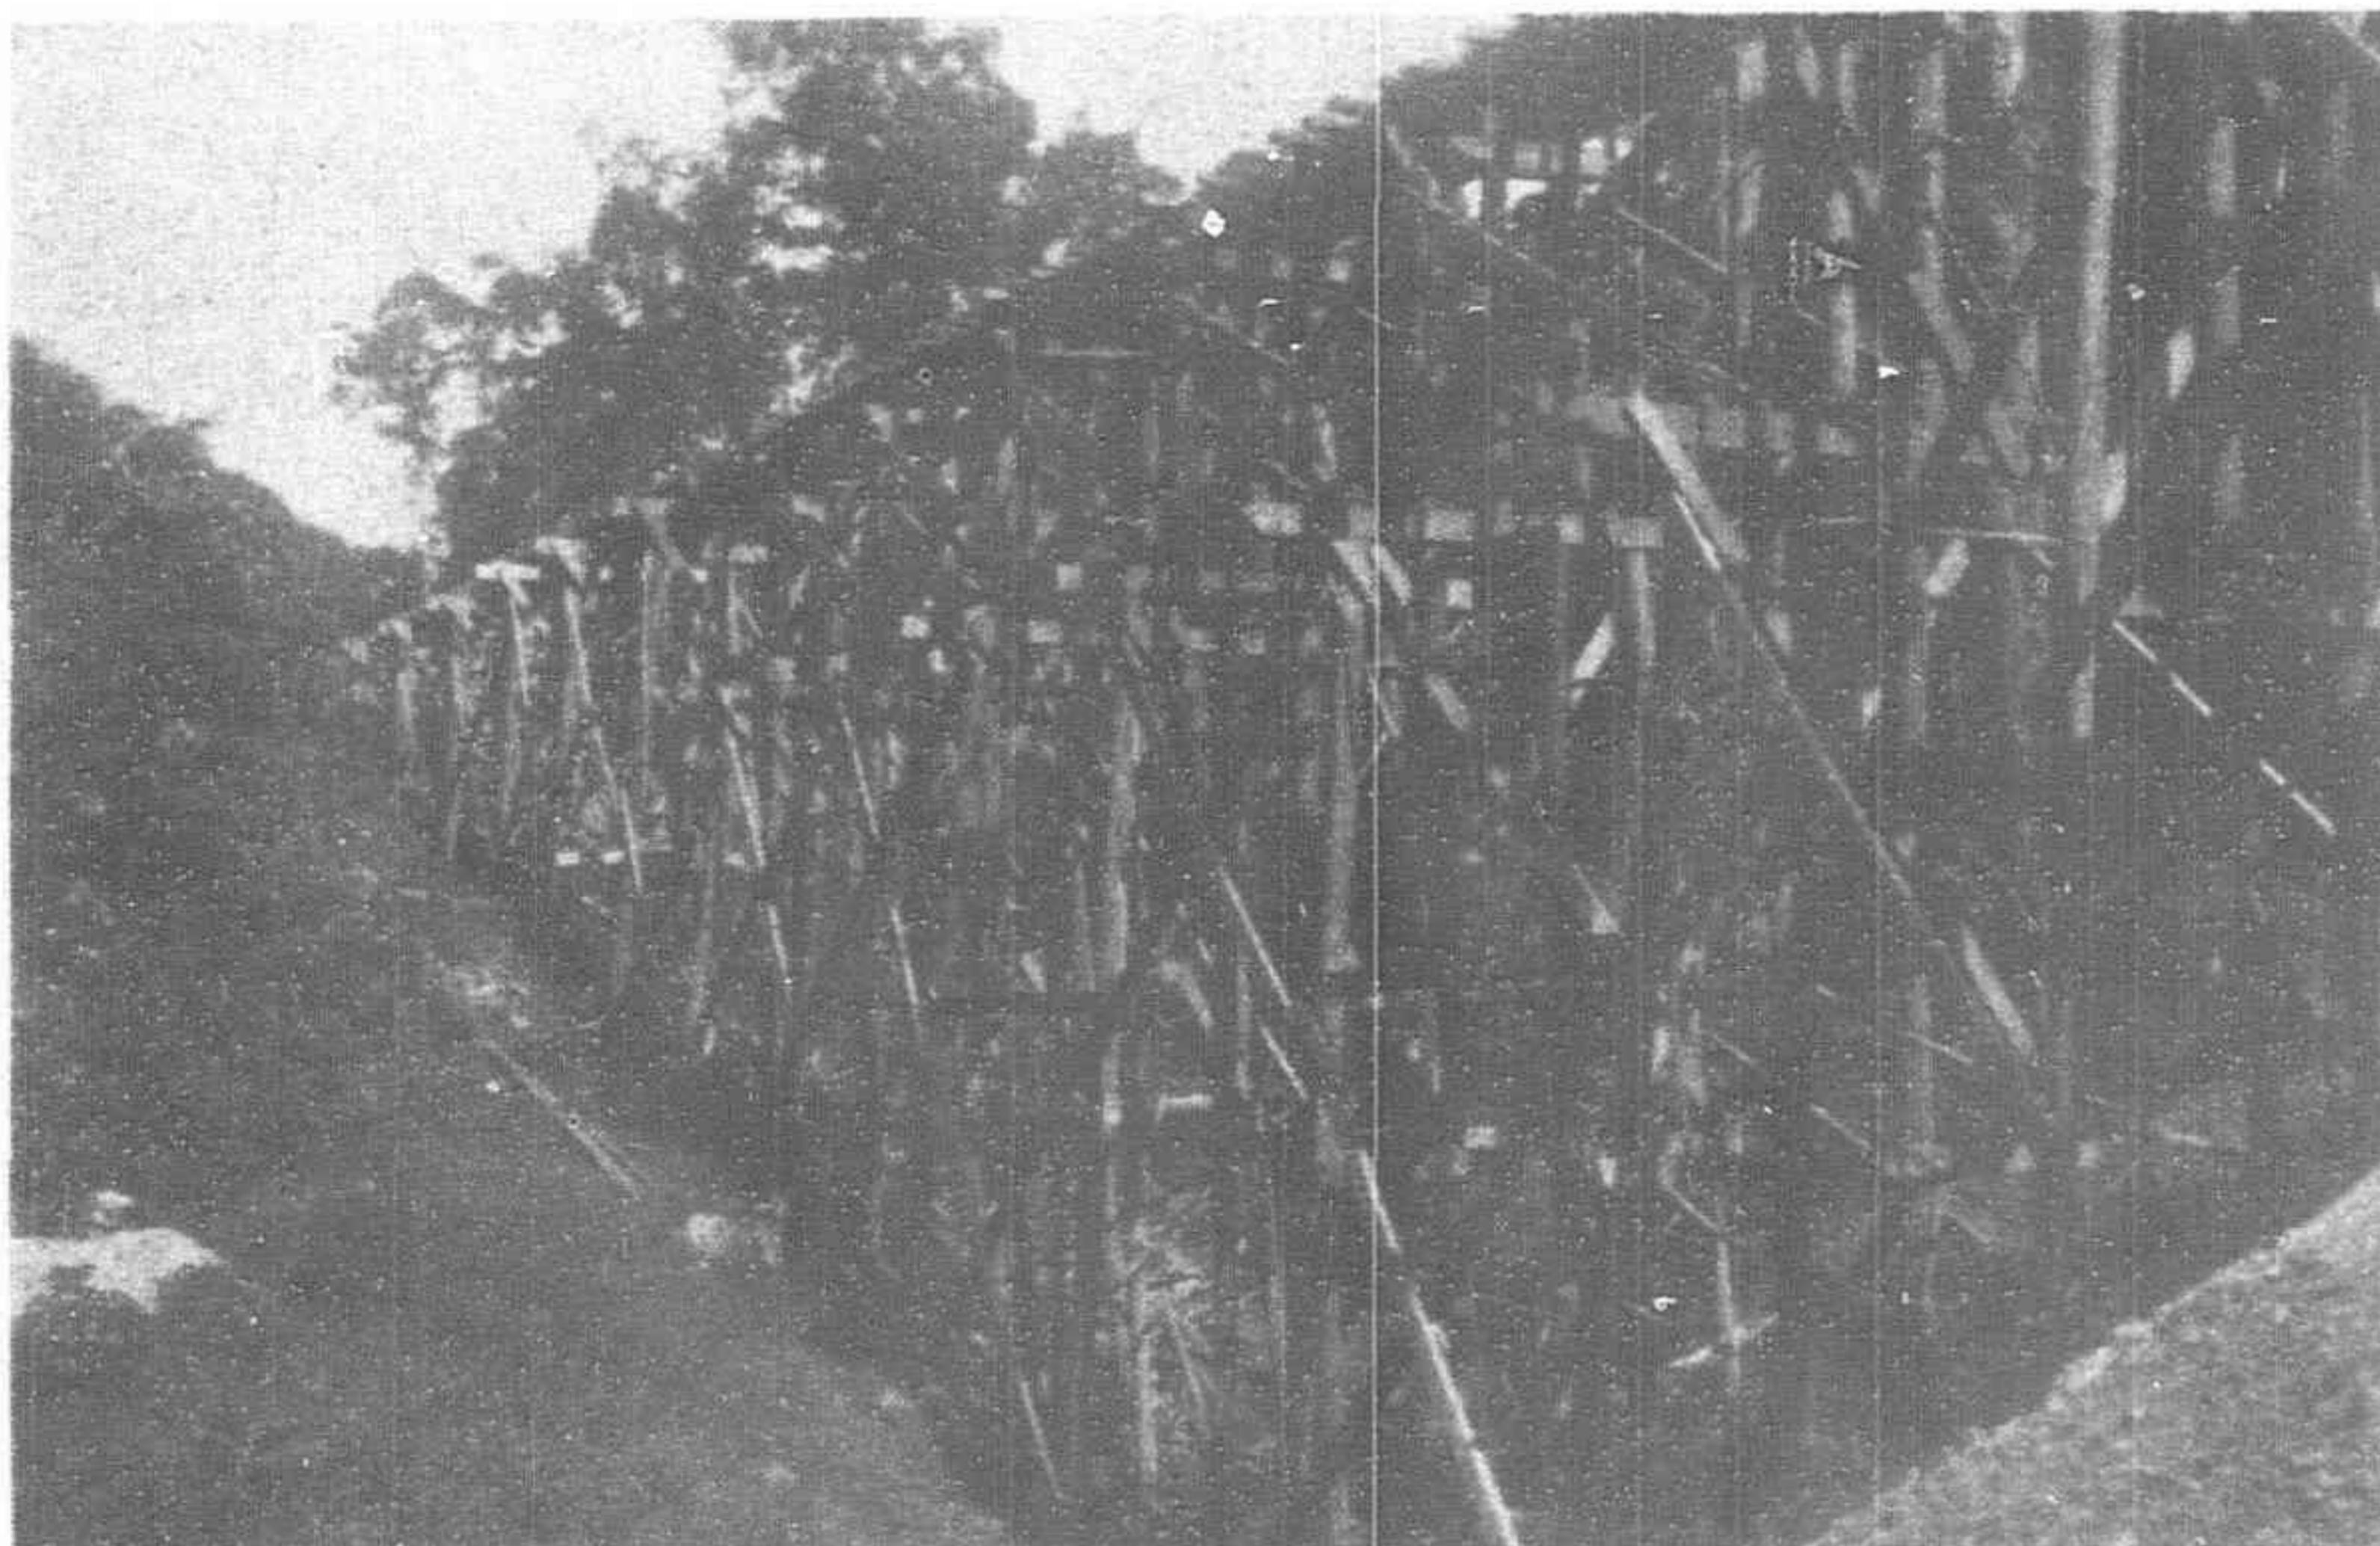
Falsework Malinao Bridge, Double Deck Frame Bents
